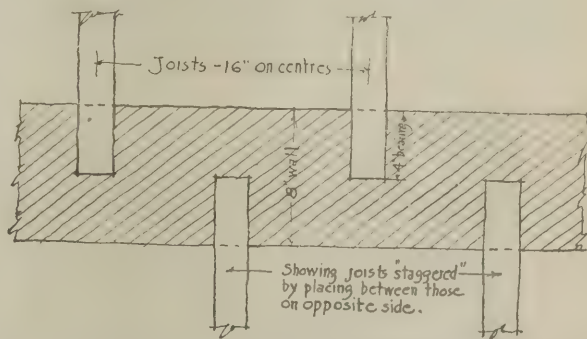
PLAN OF PARTY WALL, SHOWING HOW TO STAGGER JOISTS
